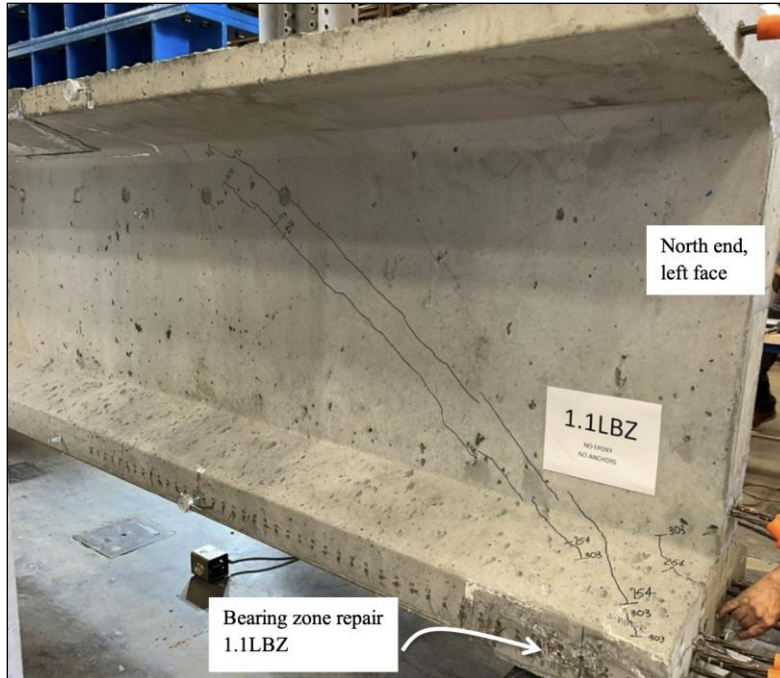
Photo. Test 1.1.S (repair 1.1LBZ) initial shear cracks on the repaired girder side (left face of girder pictured). The repair zone is at the bottom right in this figure. Note that the diagonal cracks and strut orient toward the edge of the bottom flange.
